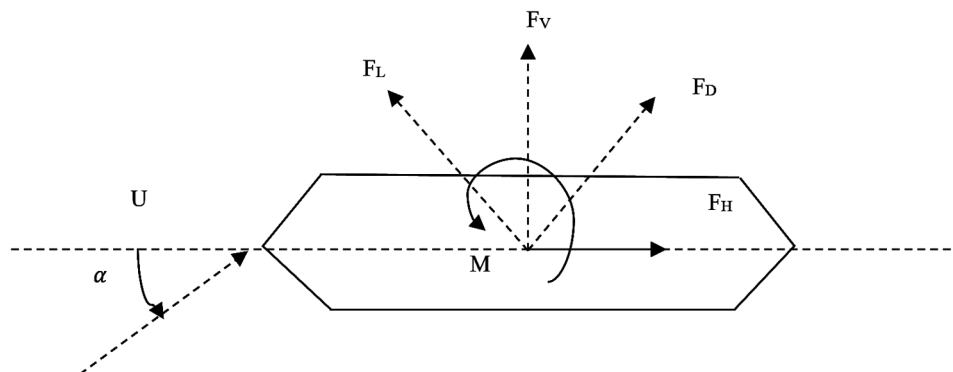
Force and moment direction on trapezoidal box girder bridge (TBGB).
